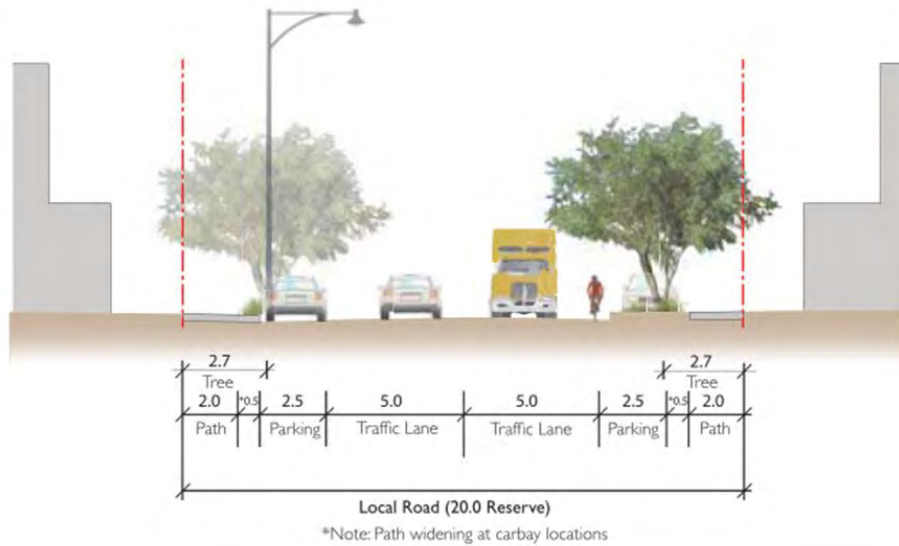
Proposed Road Reservation Width and Cross-Section for the Local Roads
